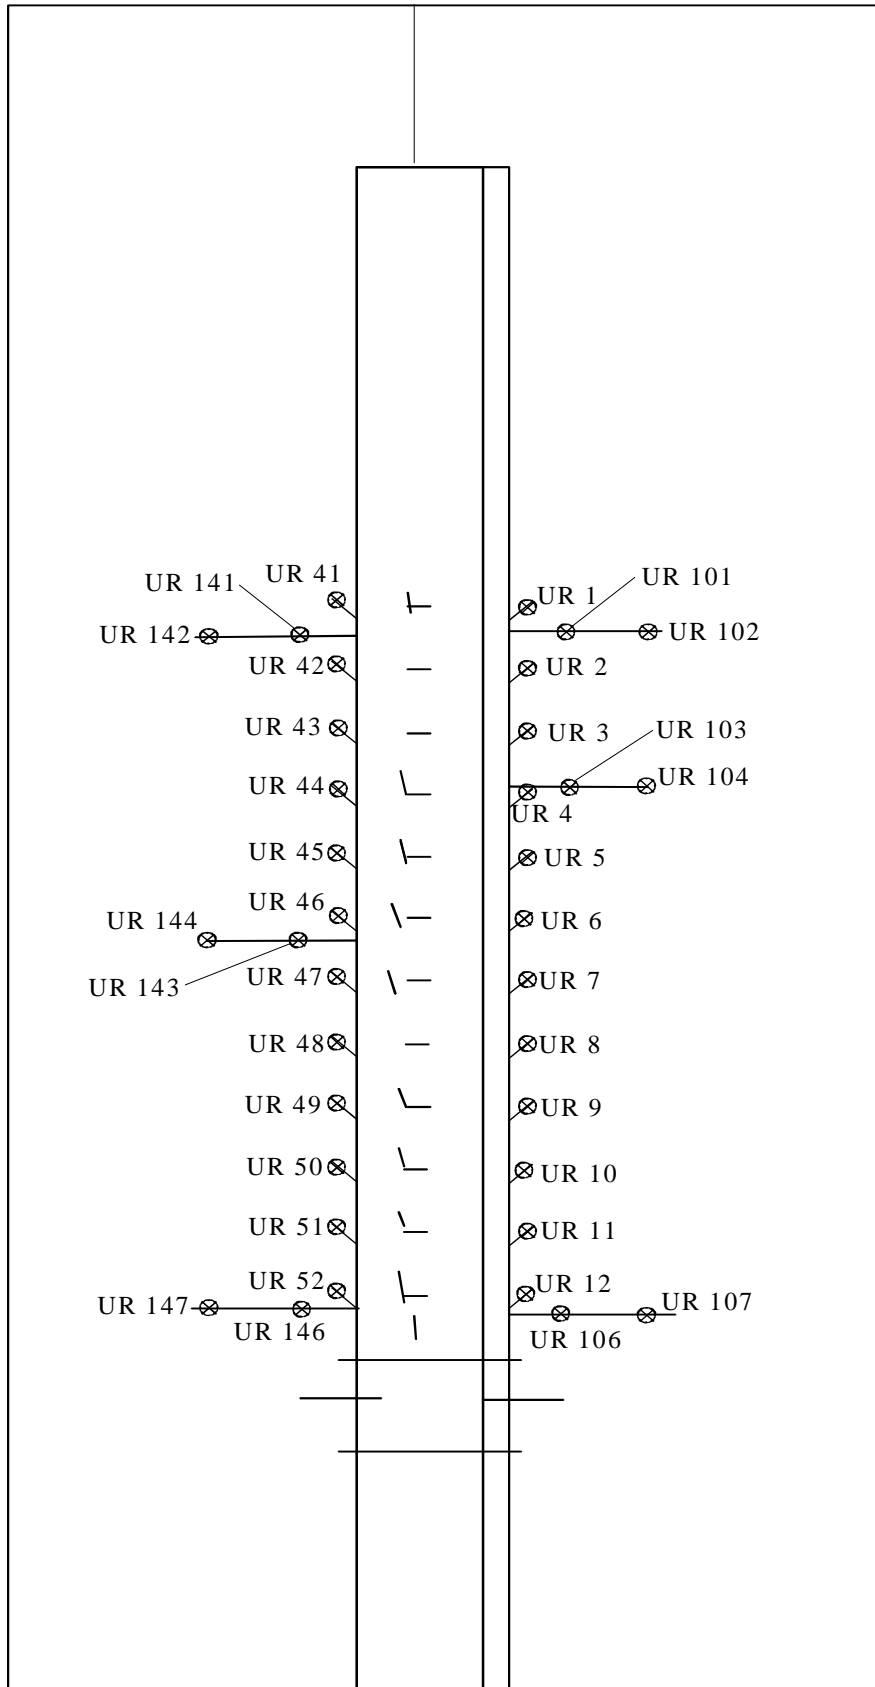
Position of measuring points in the boreholes of the rock in the floor (left part) and the roof. Vertical section.
